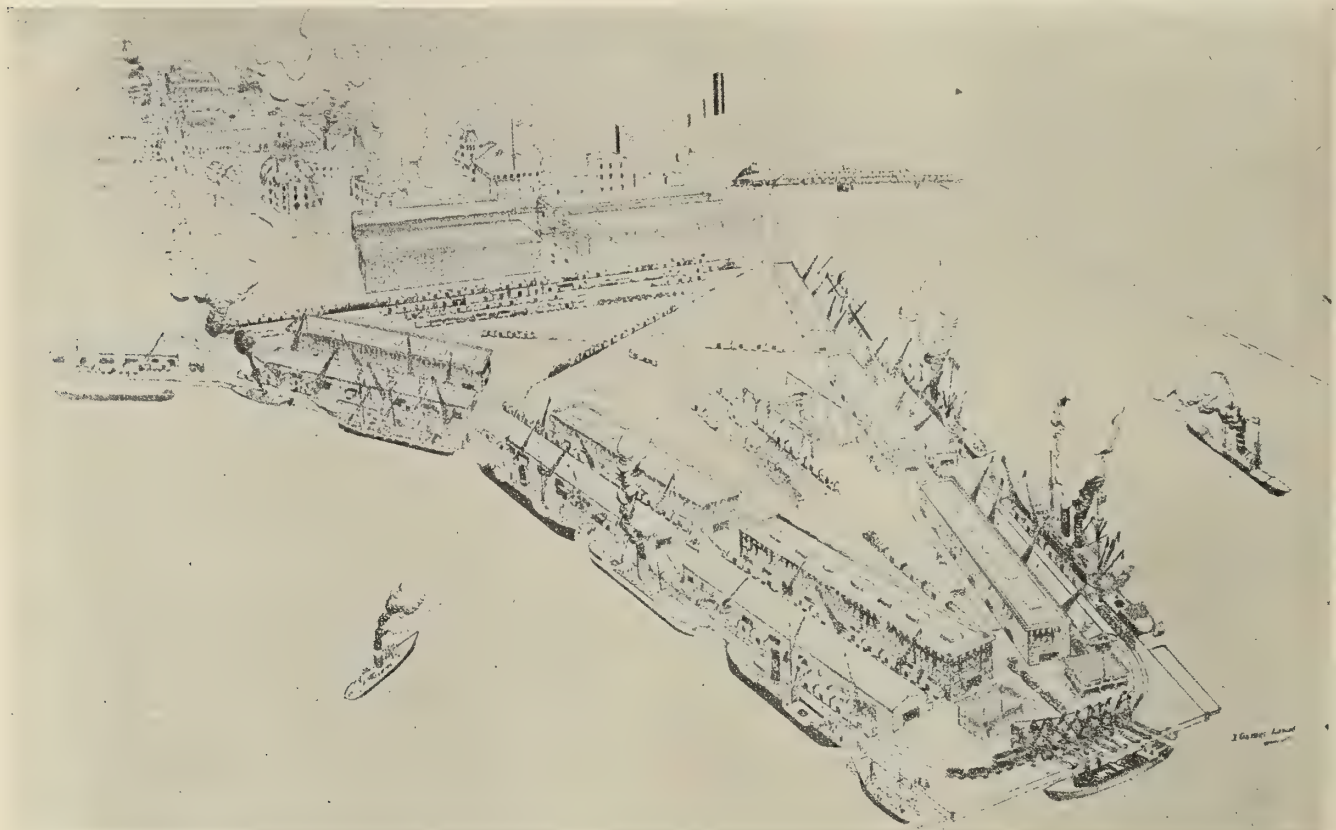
Architect's Sketch Showing Plan of Harbor Improvements at Beaumont, Texas
